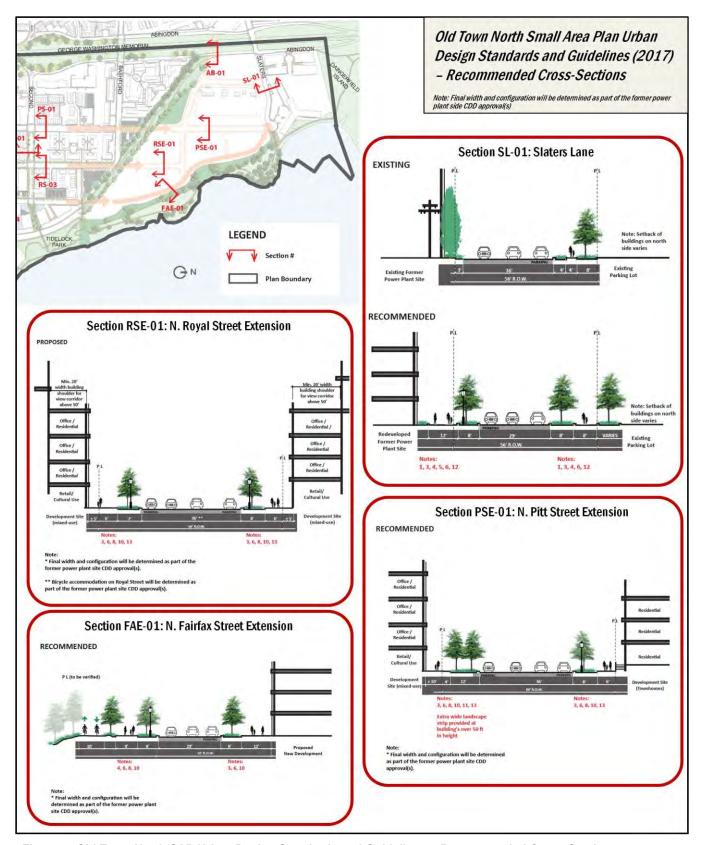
Old Town North SAP Urban Design Standards and Guidelines – Recommended Cross-Sections
